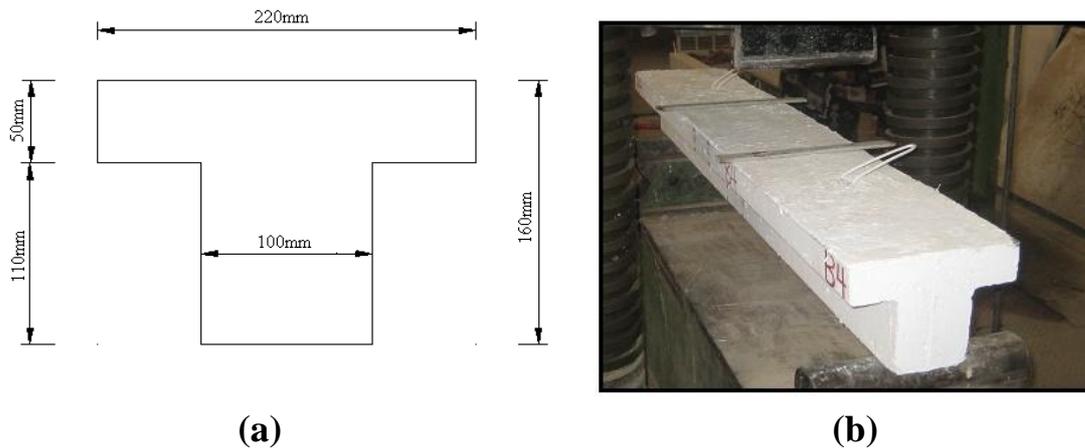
Details of tested beams (a) Beam cross-section (b) Isometric plate
